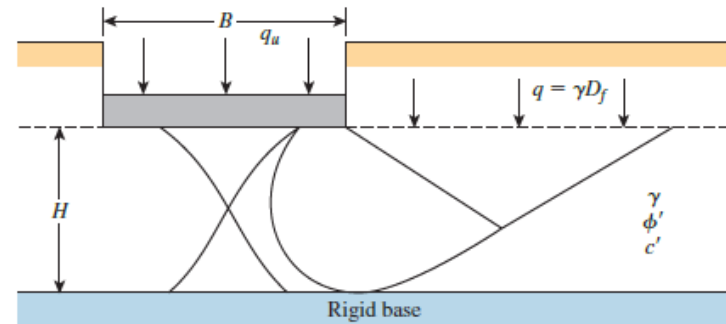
Failure surface under a rough continuous foundation with a rigid rough base located at a shallow depth
